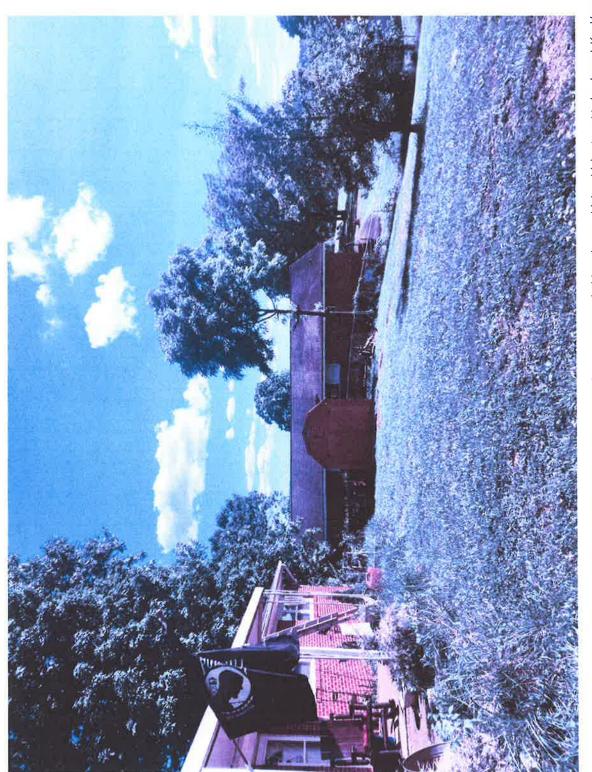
front yard right of driveway contains water lines for house and septic system not suitable to have vehicles driving to get to back yard. Yard barn will be prospectively leaving after garage is built
